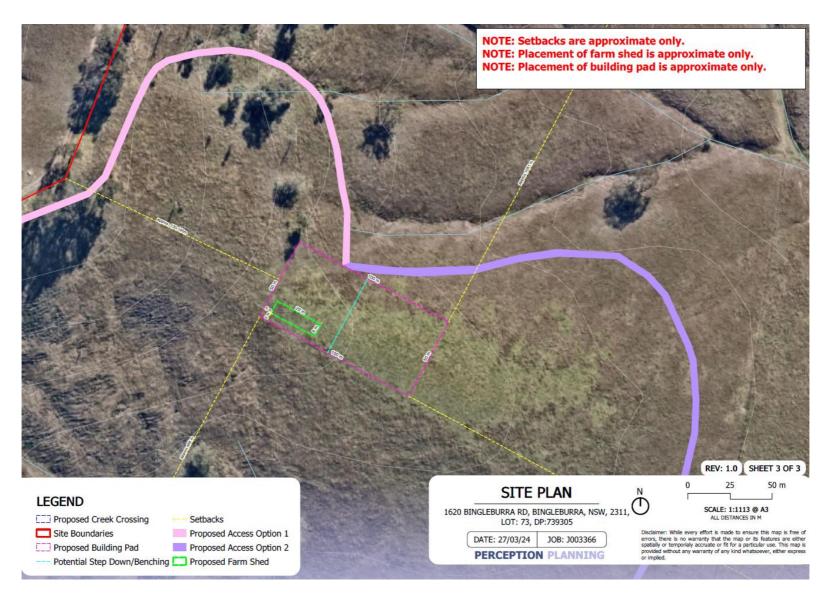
Site Plan - Sheet 3 (Perception Planning 2024)
